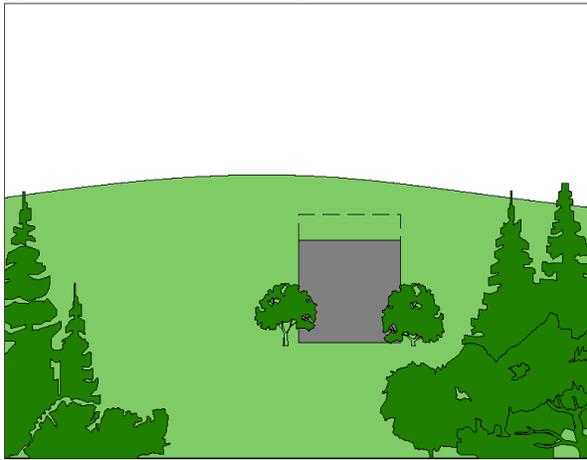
Building height is reduced and building screened to minimize impact on the viewshed
